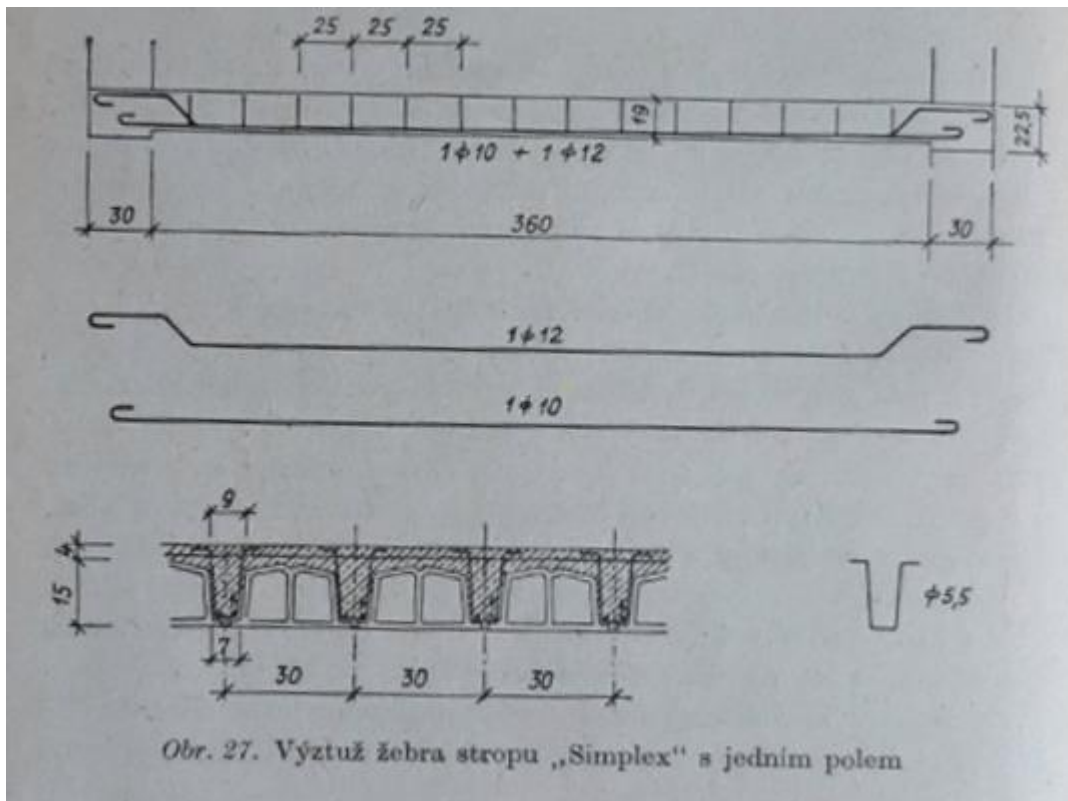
Typical composite slab reinforcing details in simple span condition [17]
